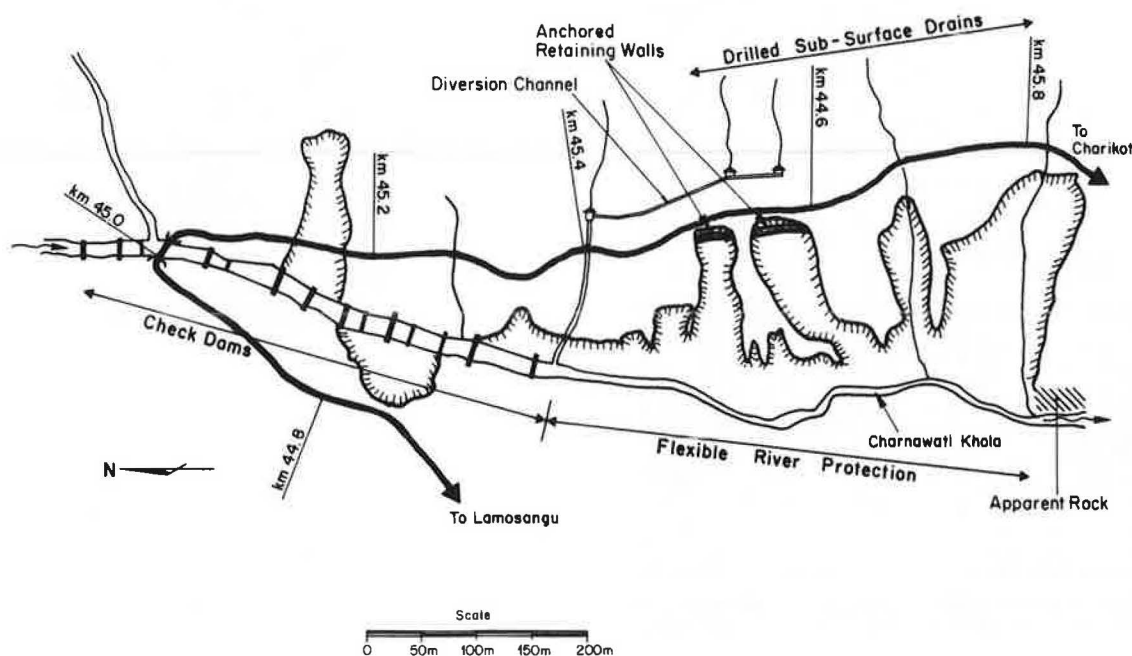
Charnawati Project: overall plan view. Only the main substantial structures are presented; drainage and biotechnical measures in the slides are not shown.
